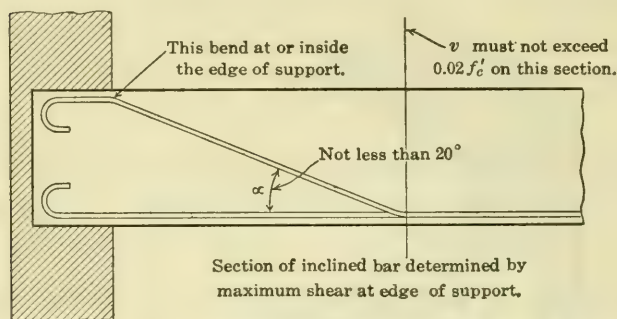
TYPICAL BEAM WITH WEB REINFORCED BY MEANS OF BARS BENT UP IN SINGLE PLANE.
